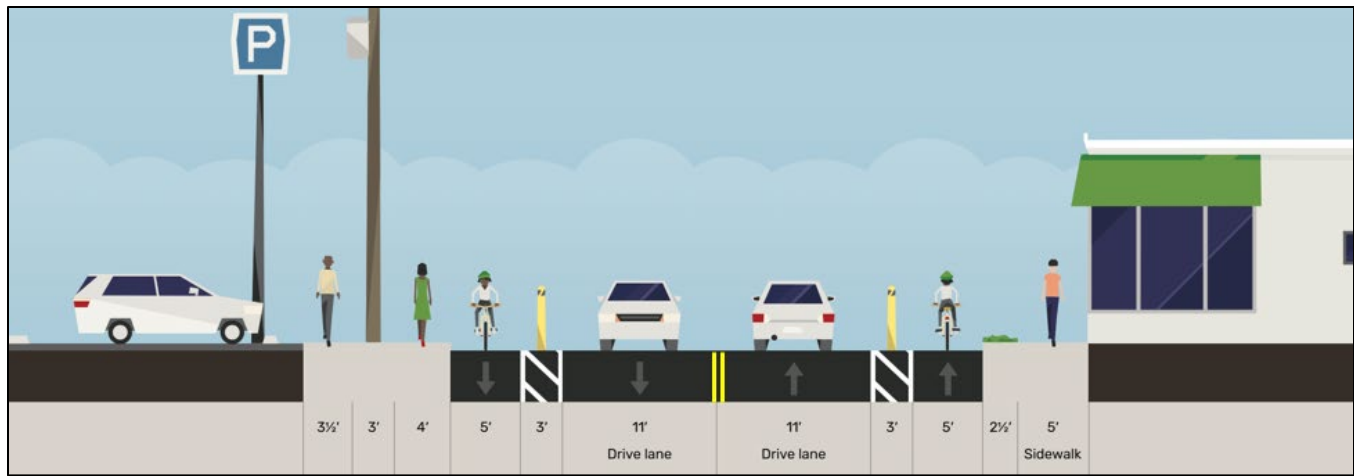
County Road Alternative Cross Section 3 (Narrows Existing Curb to Curb Width)
